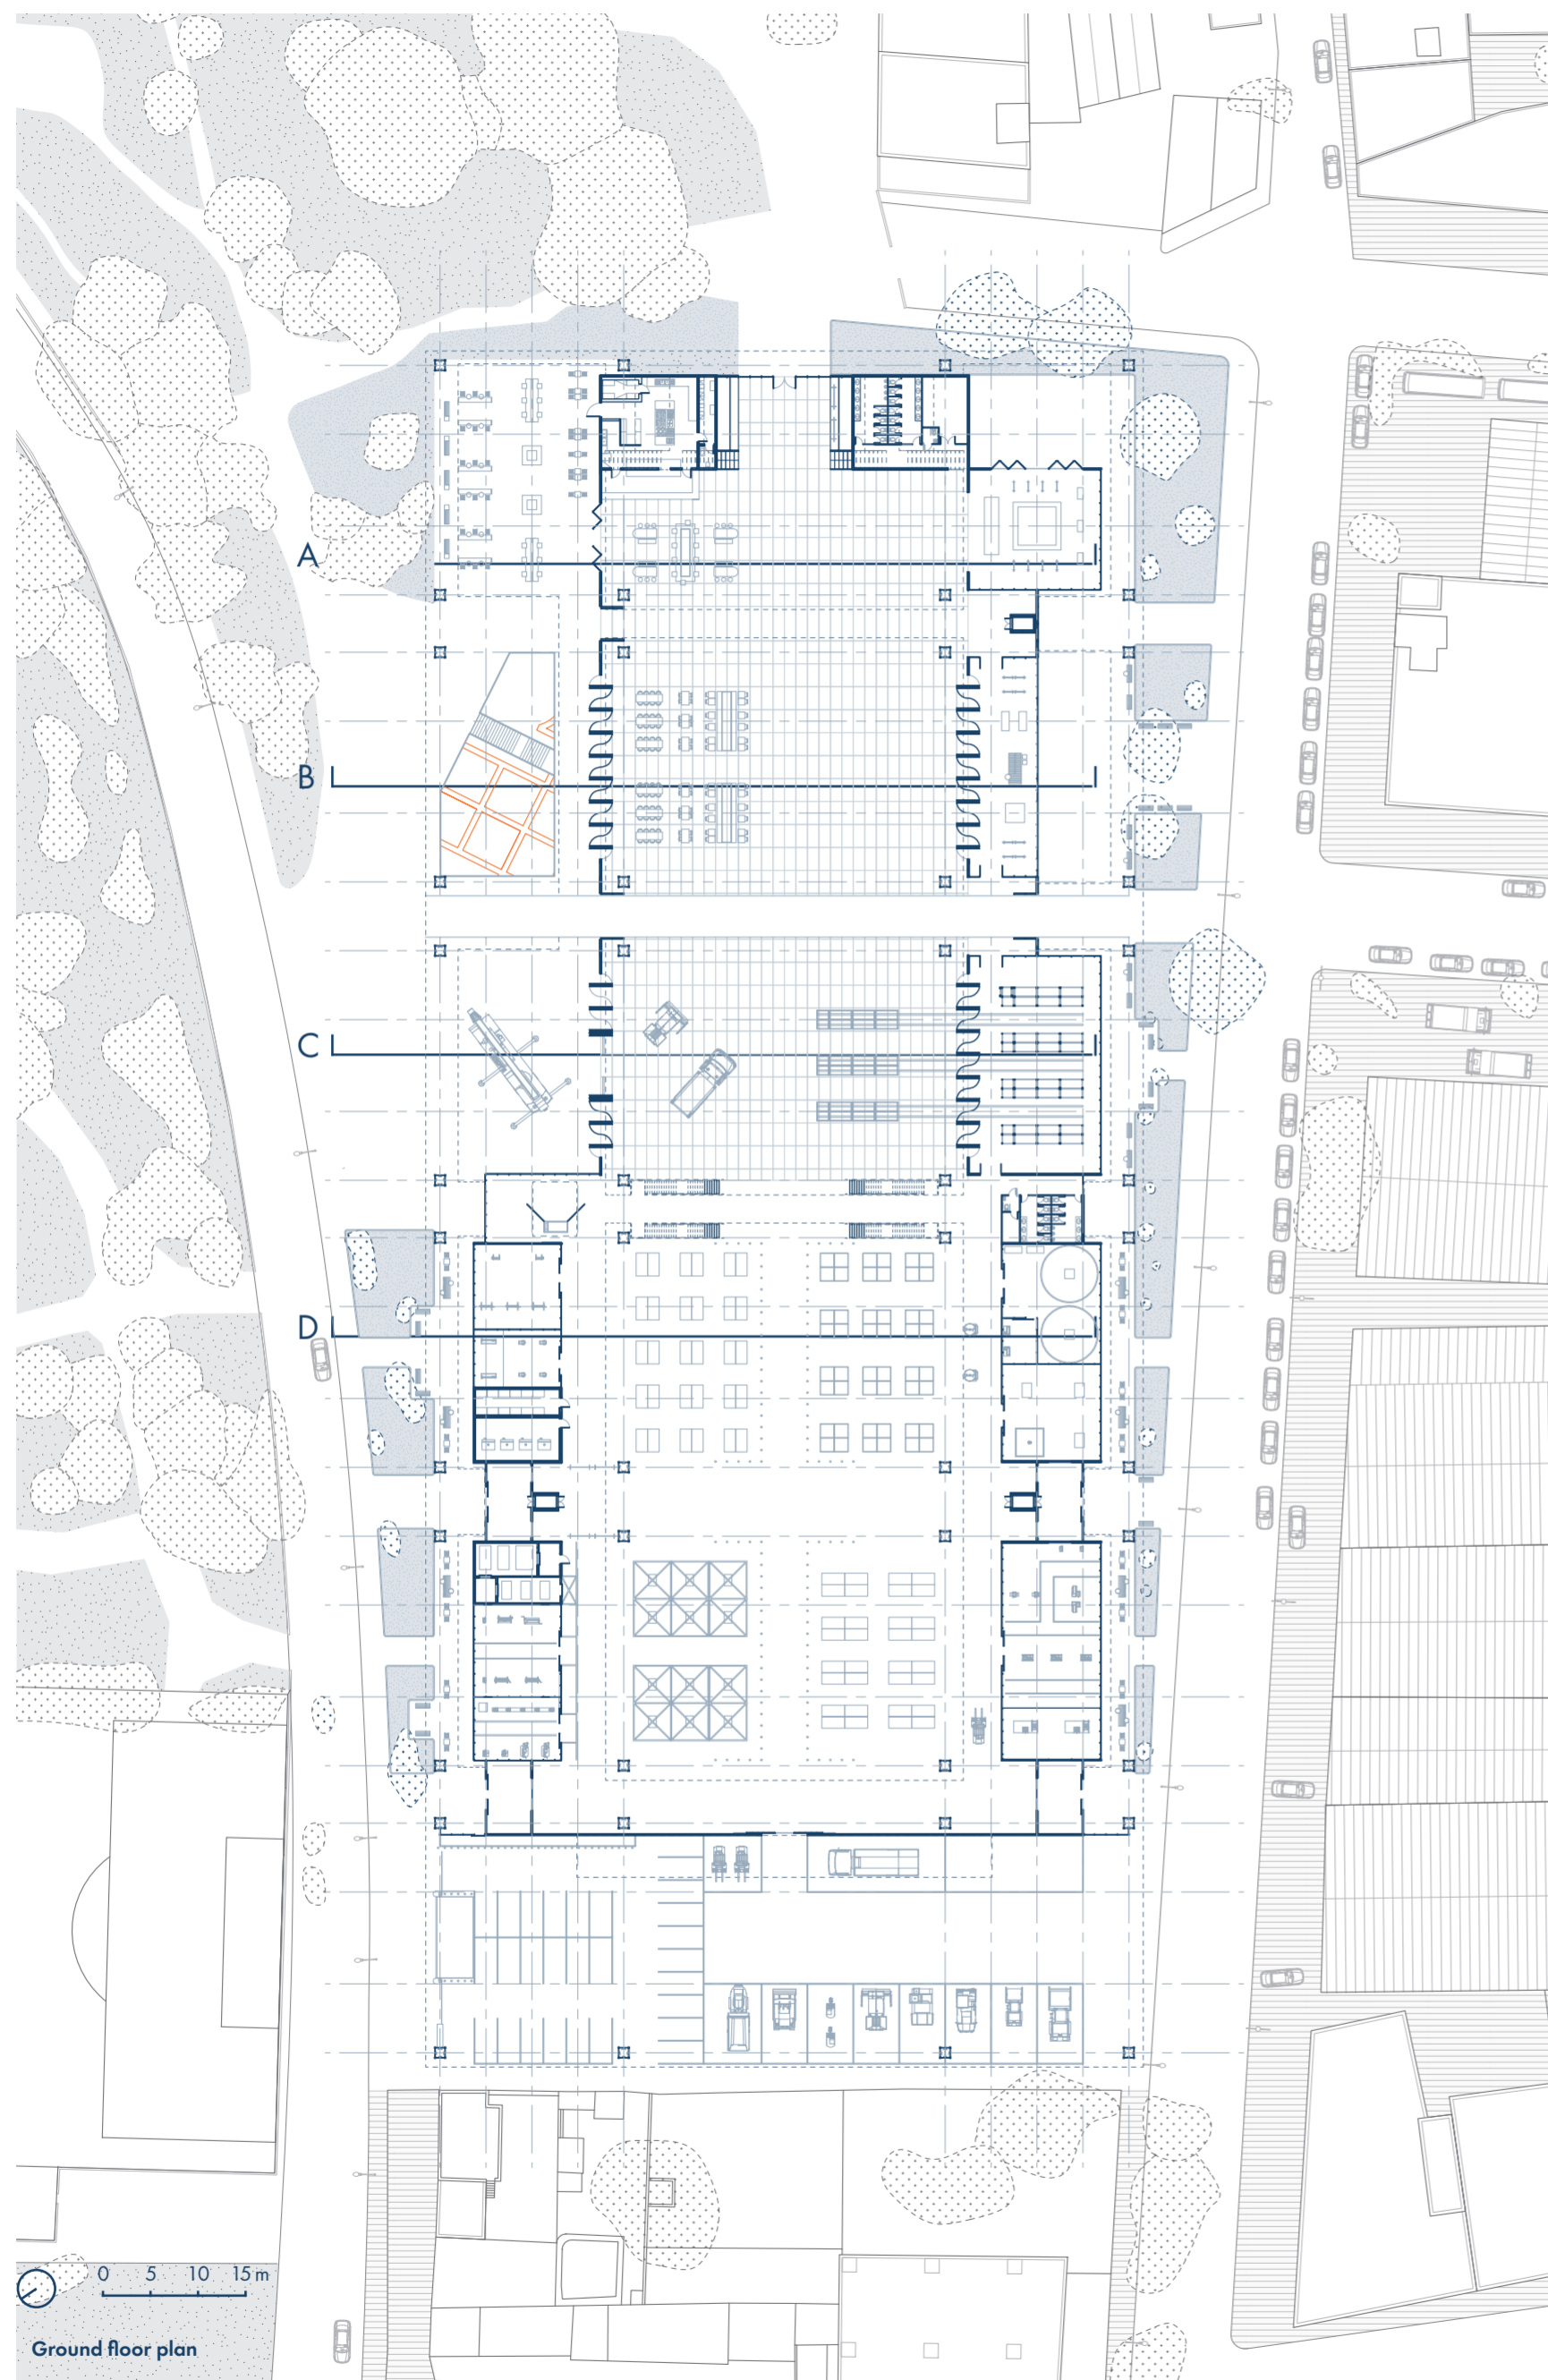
Finalized institutional Ground floor plan. (Drawing by author, 2026).
